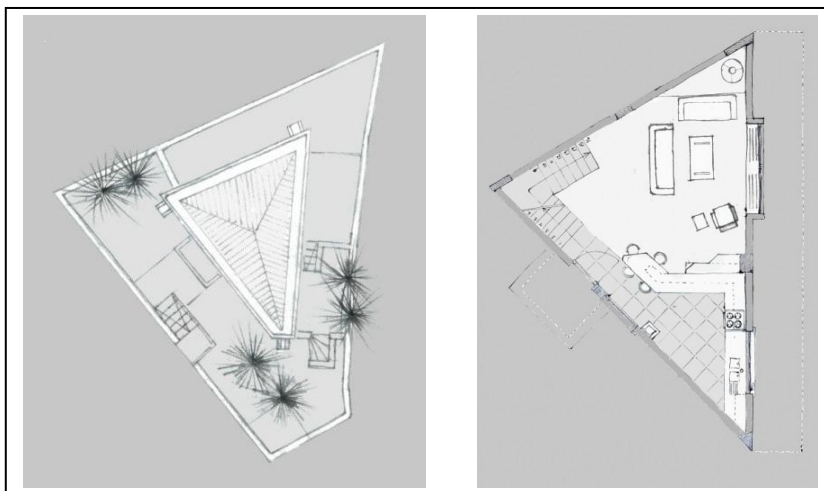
Site plan and floor plan of triangle house, 1991 [160]
